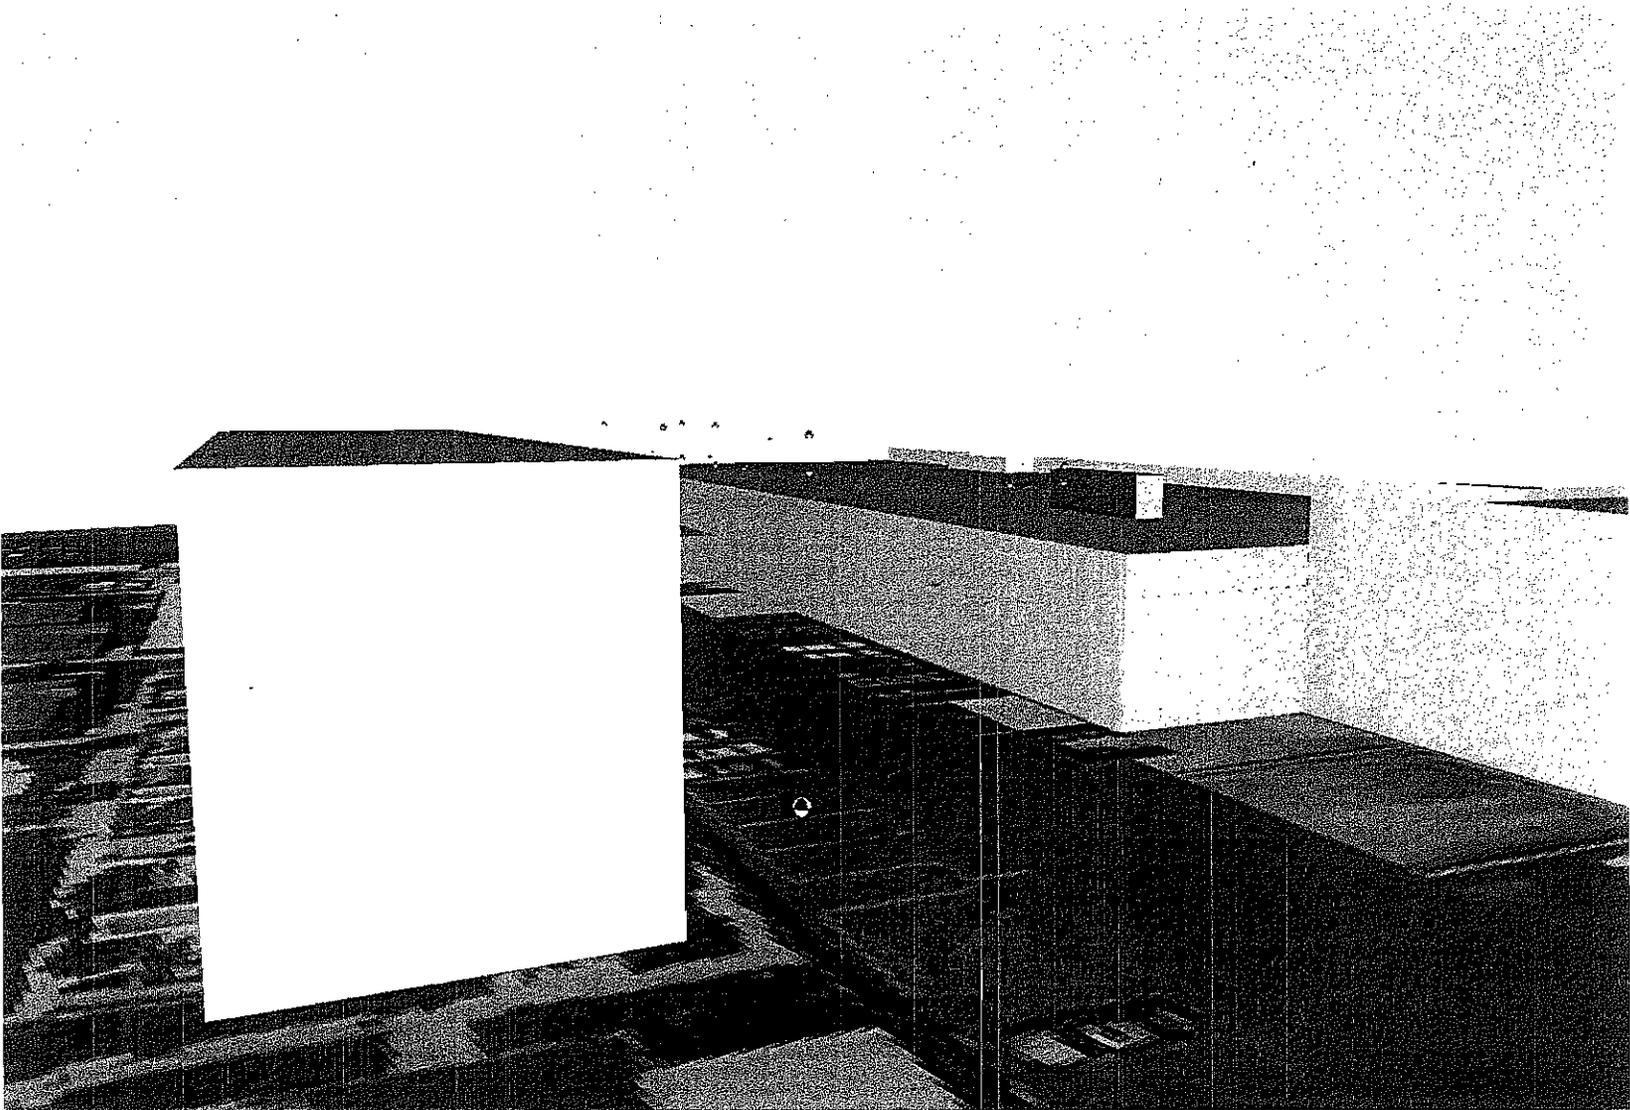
EXISTING ROOF PARAPET (AIXTRON BUILDING ON RIGHT)
